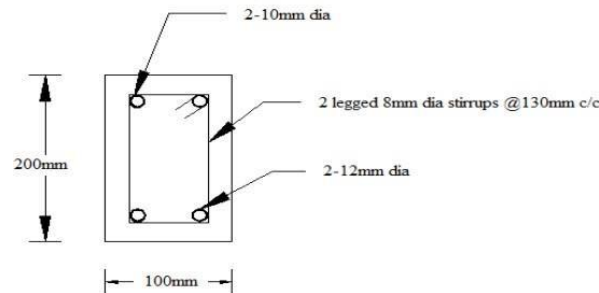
FIG III. REINFORCEMENT DETAILS FOR BEAM CROSS SECTION
